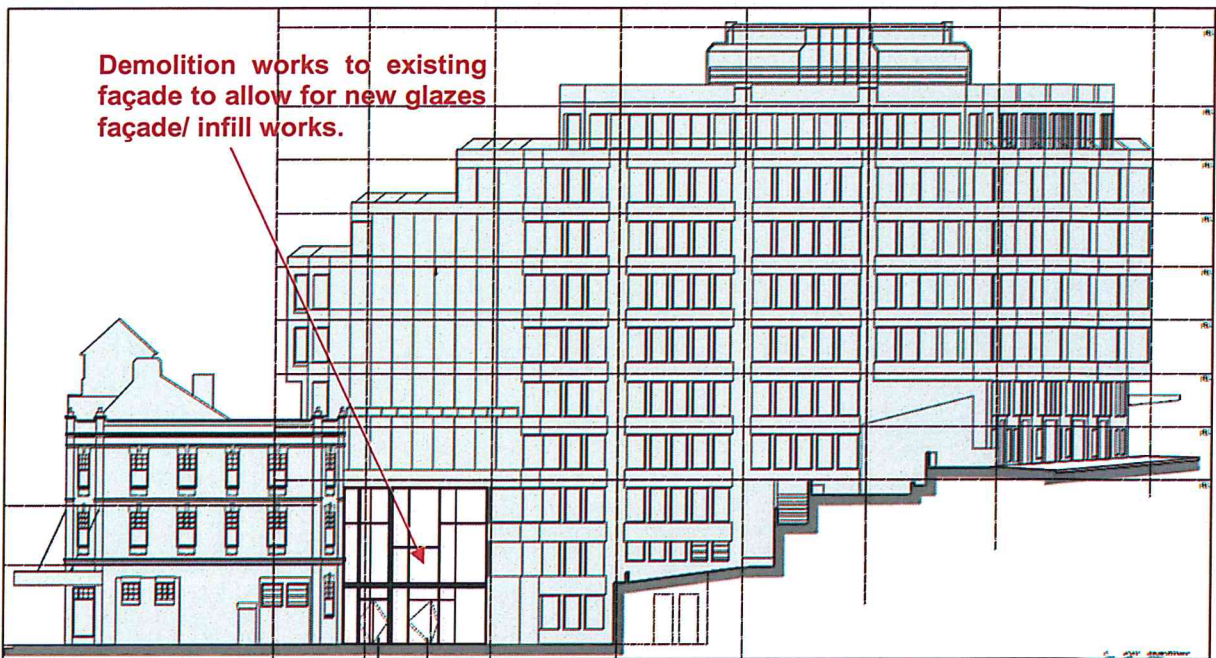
Globe Street elevation- new glazed façade element. (Source: PMDL)
